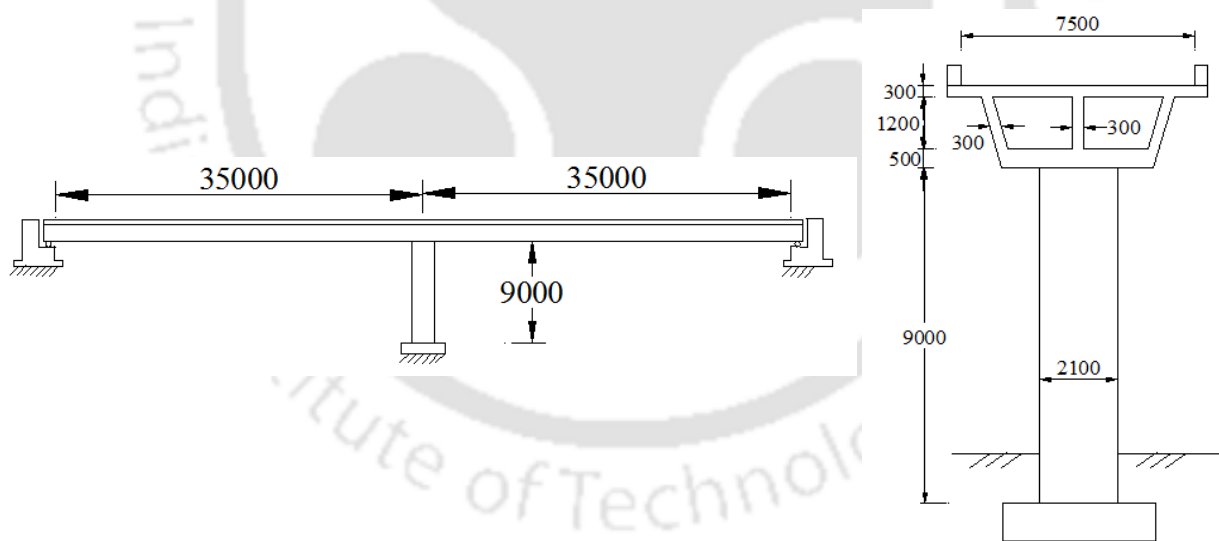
Elevation of Prototype Bridge (All dimensions are in mm)
